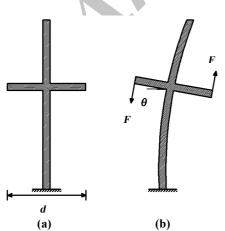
Couple force applied to exterior columns axially, (a) undeformed shape of outrigger-belt truss and column and (b) deformed shape of outrigger-belt truss and column
